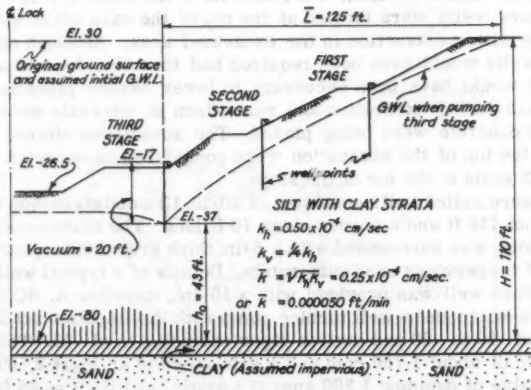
SECTION THROUGH EXCAVATION SLOPE
